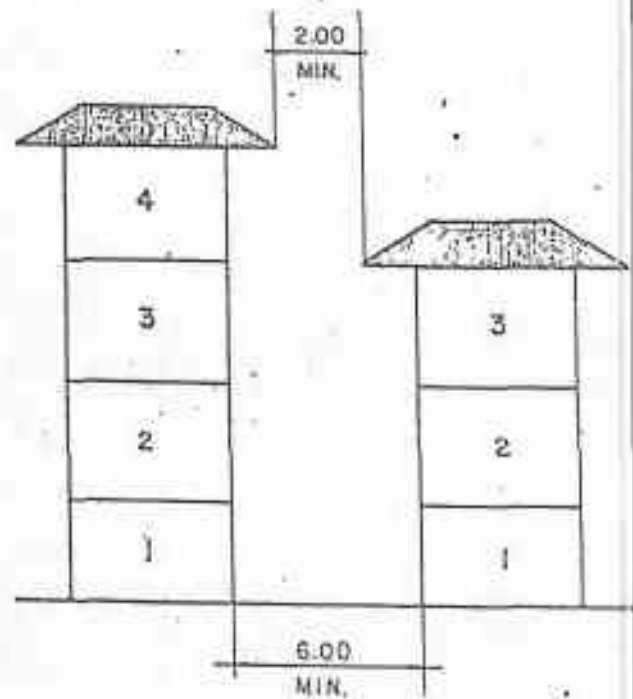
DISTANCE BETWEEN 3-STOREY BUILDINGS
